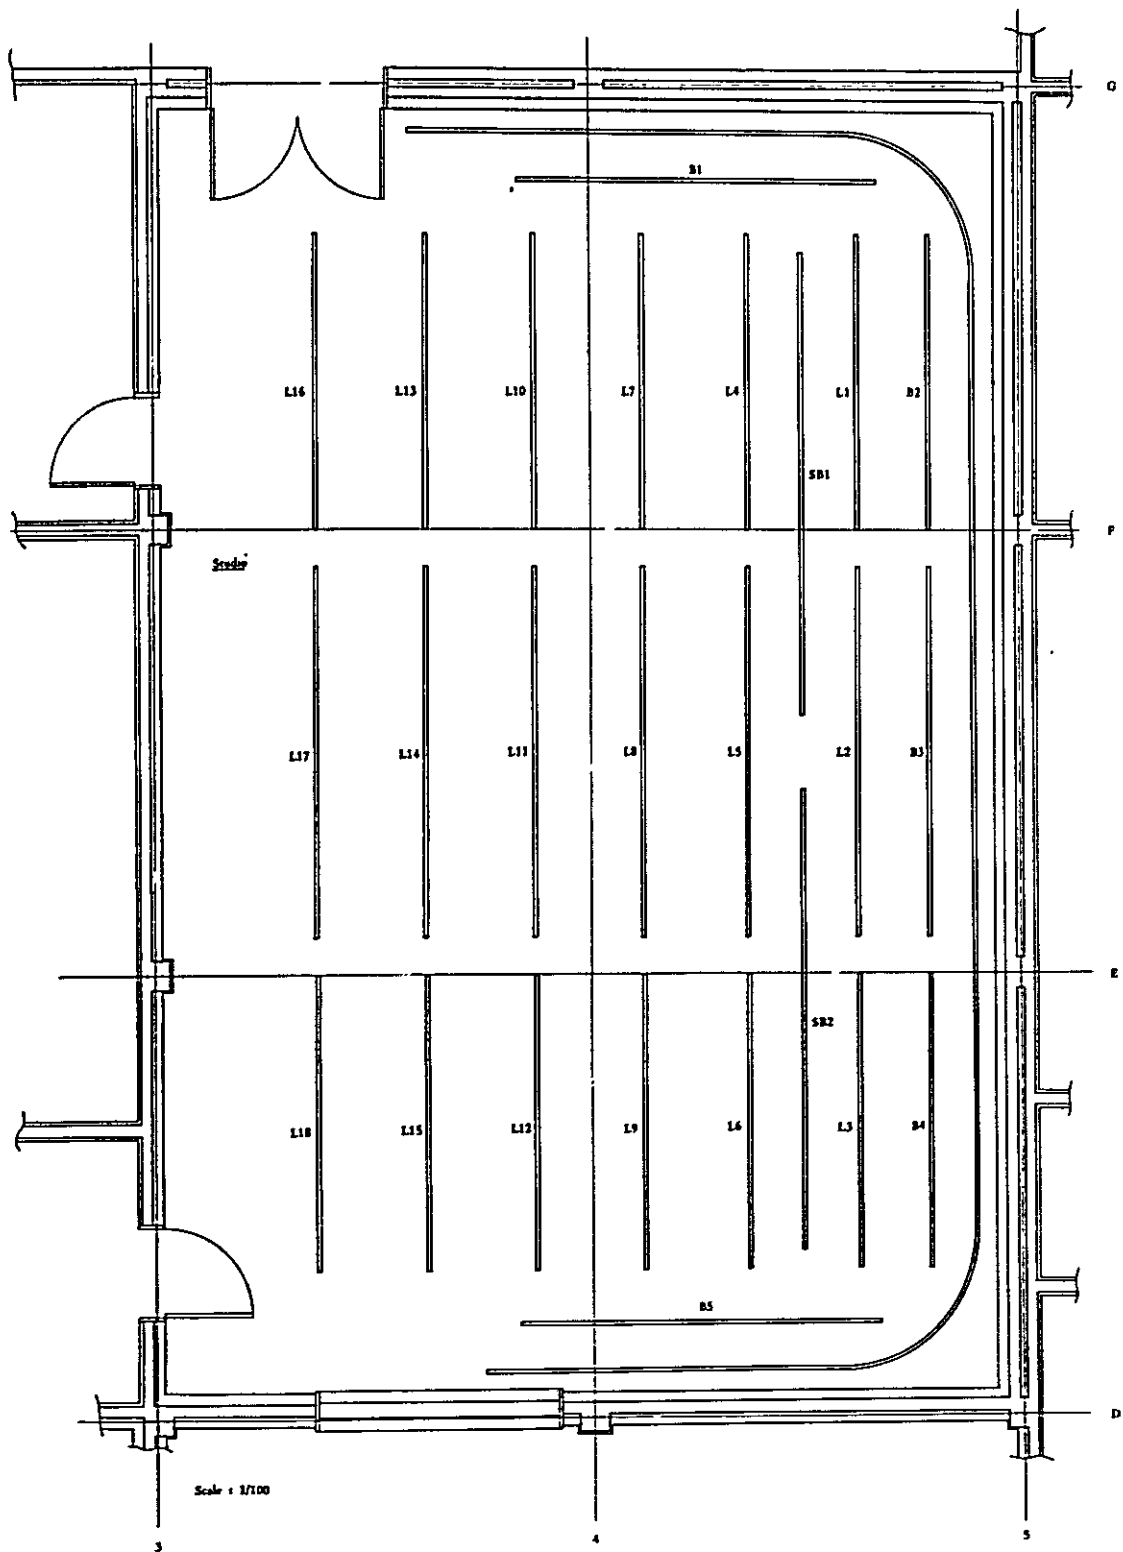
BOLGATANGA-Regional Station TV-BLOCK SITE PLAN
